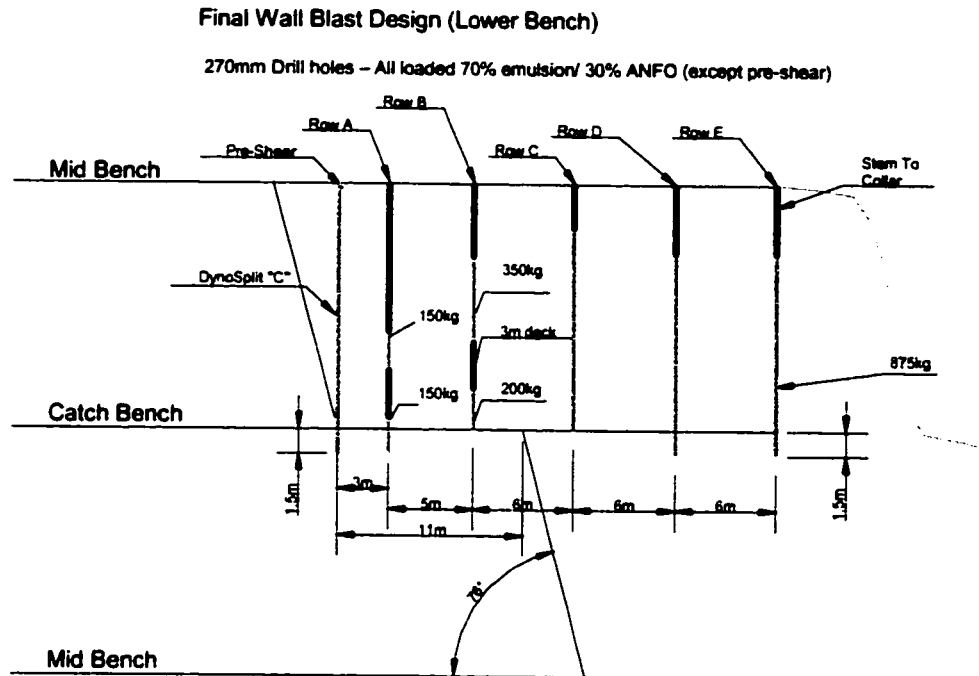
Section view of trim-blast design for lower half of 30m bench
